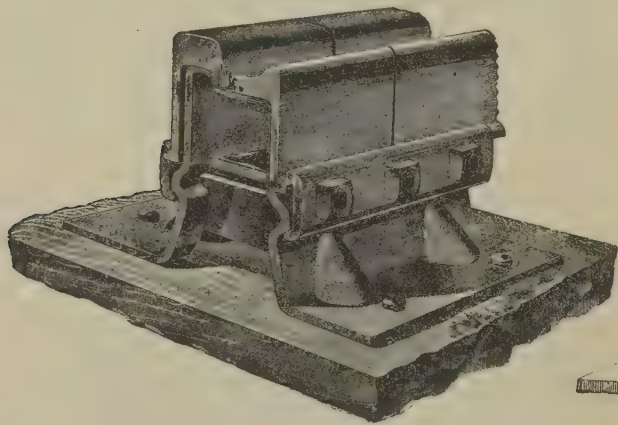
NINE INCH JOINT CHAIR FOR BOX GIRDER.
